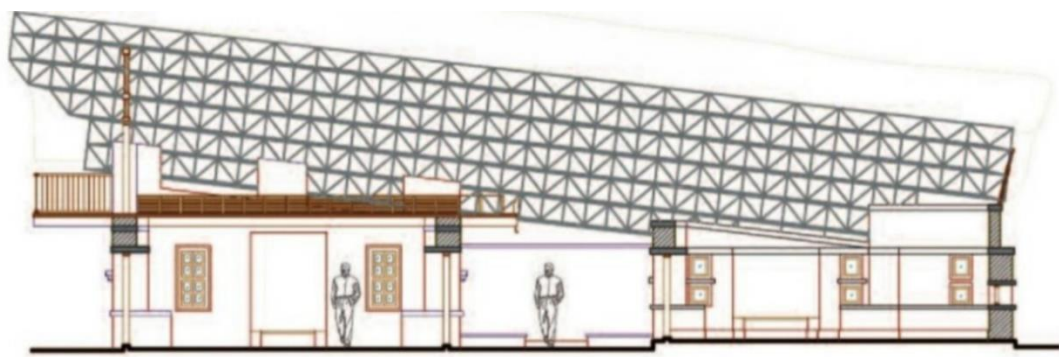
Section showing space frame use; Source: Vermani.S. (2014). Innovative Traditional system.architecture+design
